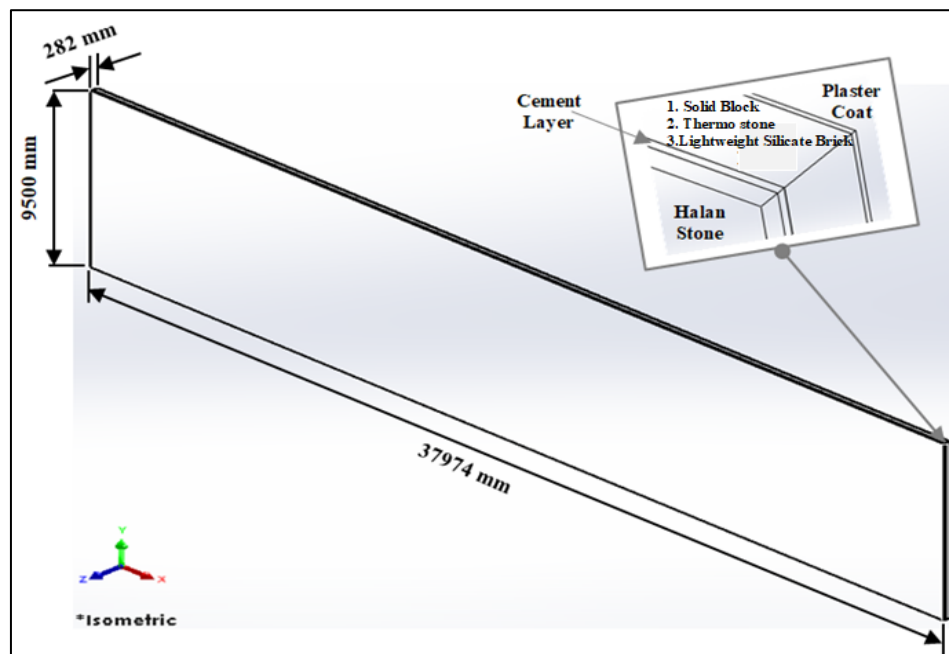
The shape, dimensions, and cross-section of the Halan stone walls
